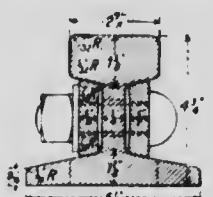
,665.—Section of L. & N.W. Railway Conductor Rail.
